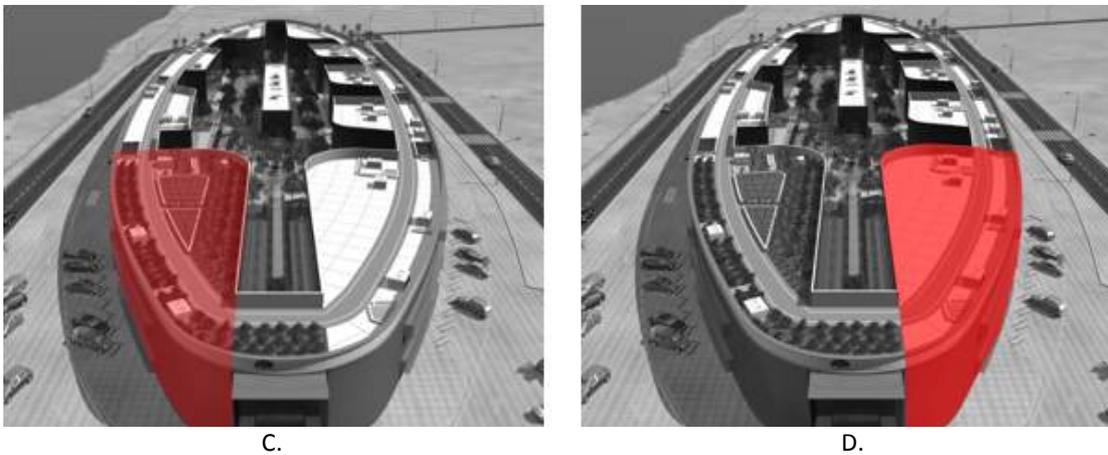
C. "B1" LEED certified building. D. "B2" non-LEED certified building. Source: ALARGAN Co.
